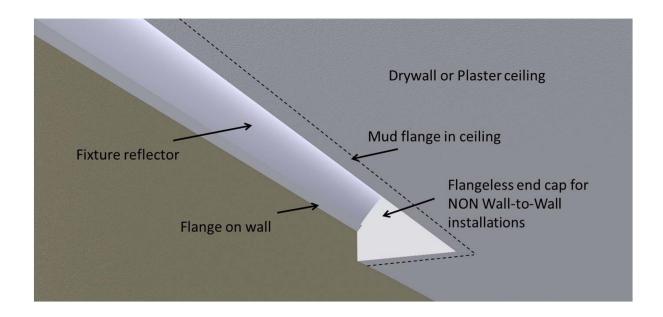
Detail C. PLASTER RAIL IS NOT MUDDED INTO BACK WALL, FIXTURE'S MUD FLANGE IS MUDDED INTO DRYWALL OR PLASTER CEILING. FIXTURE IS SHOWN BUTTED AGAINST SIDE WALL.
